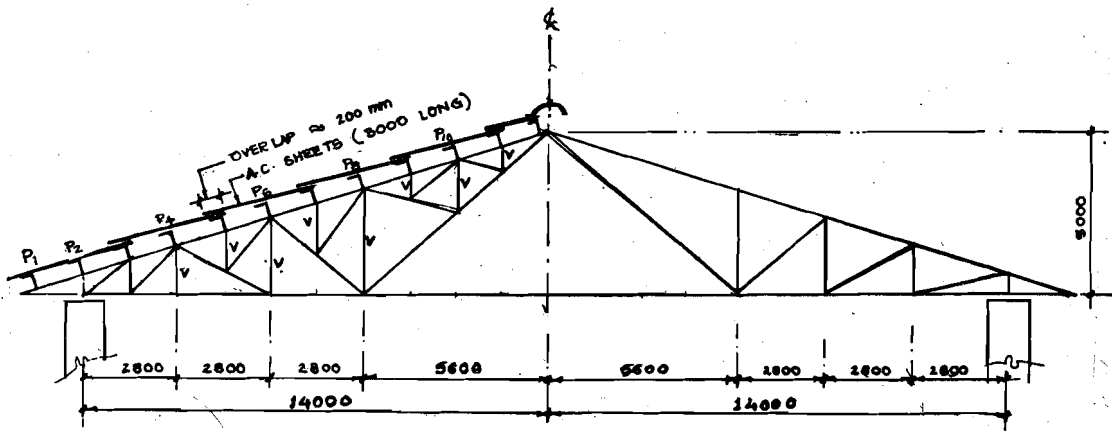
(b) : Alternative Internal Pattern of Truss Member with Shorter Vertical Member at Support
